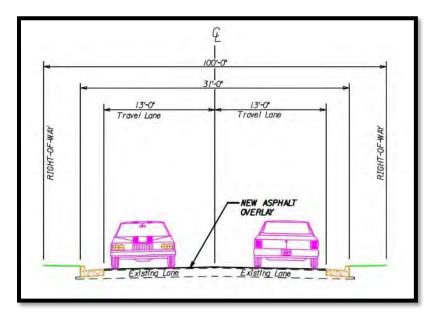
Proposed Typical Section – Alternative 4 & 5– Hook St. from Sixth St. to North Commons Street
